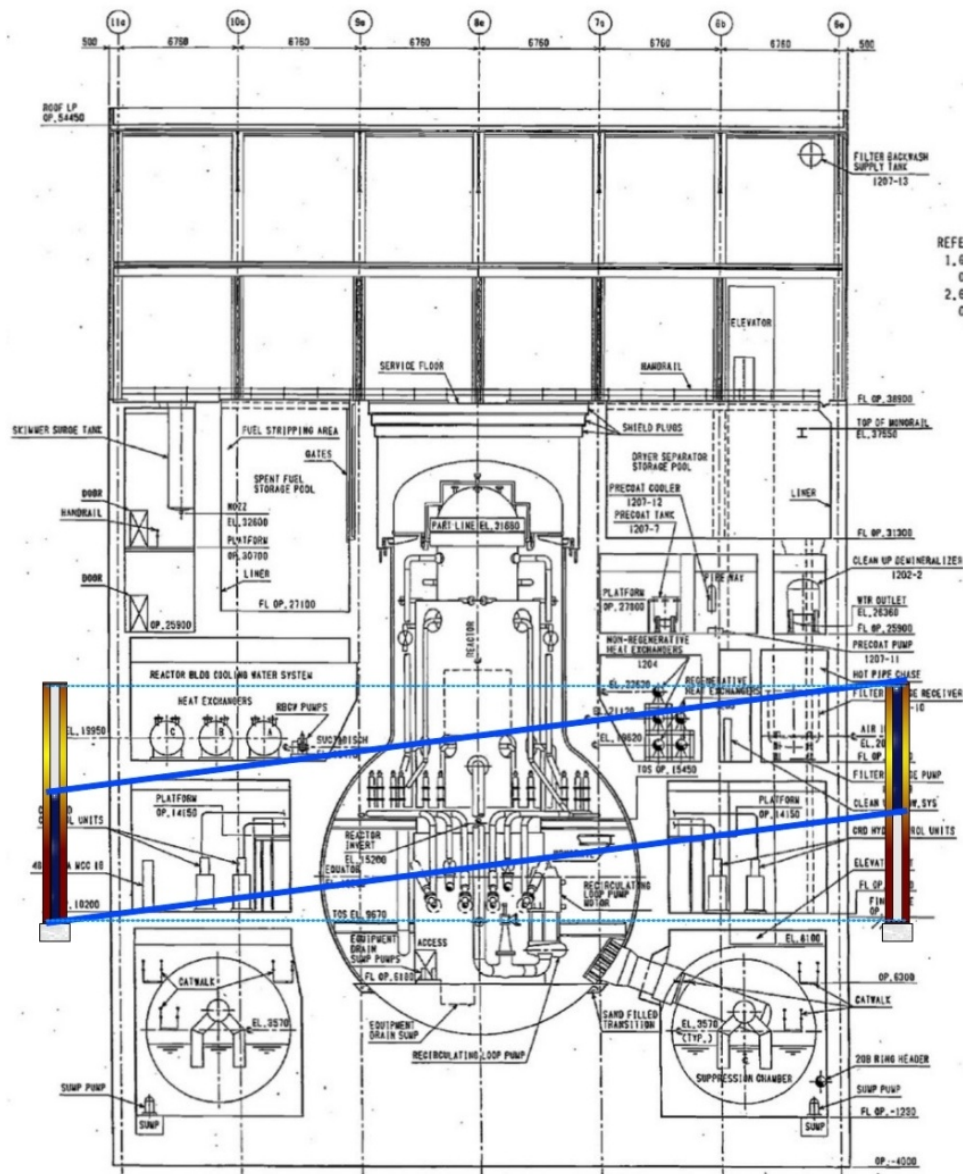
Proposed detector setup at Fukushima Daiichi. Two muon trackers will be installed near the wall of the reactor building. The two muon trackers would be ~50-m apart.
